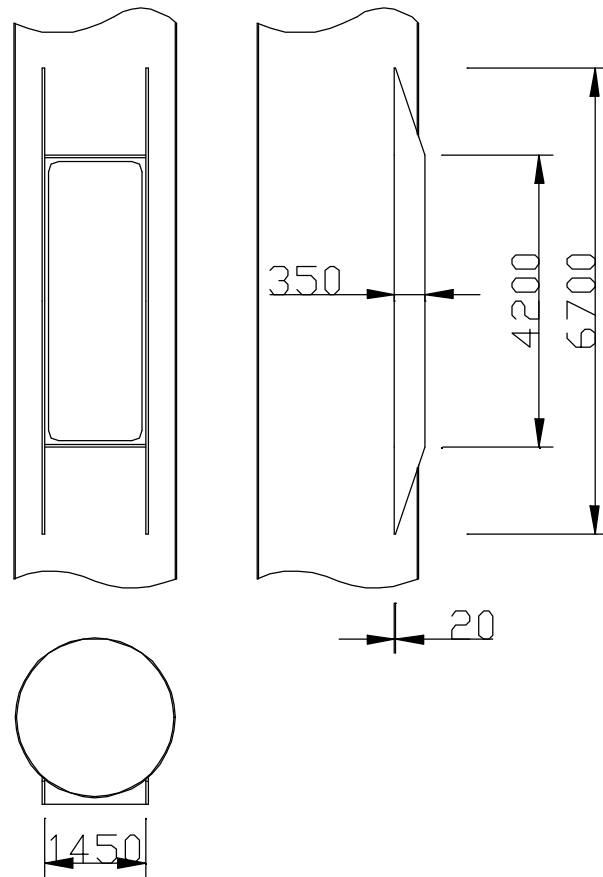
k Details of the reinforcements at the connection for inlet duct. Midpoint of hole at 13.3 m level. Thickness of the vertical reinforcement plates is 40 mm.
